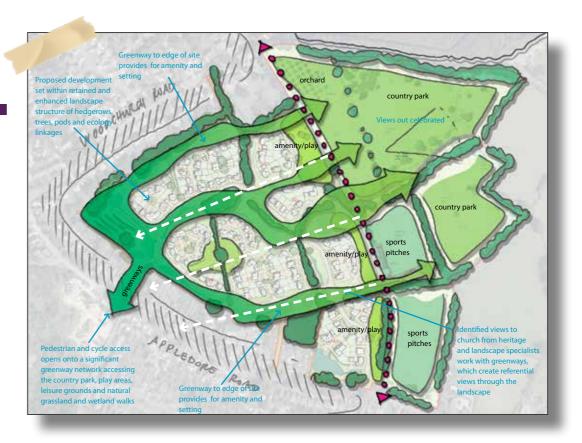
DESIGN CONCEPT PLAN TAKEN FROM THE OUTLINE DESIGN AND ACCESS STATEMENT
